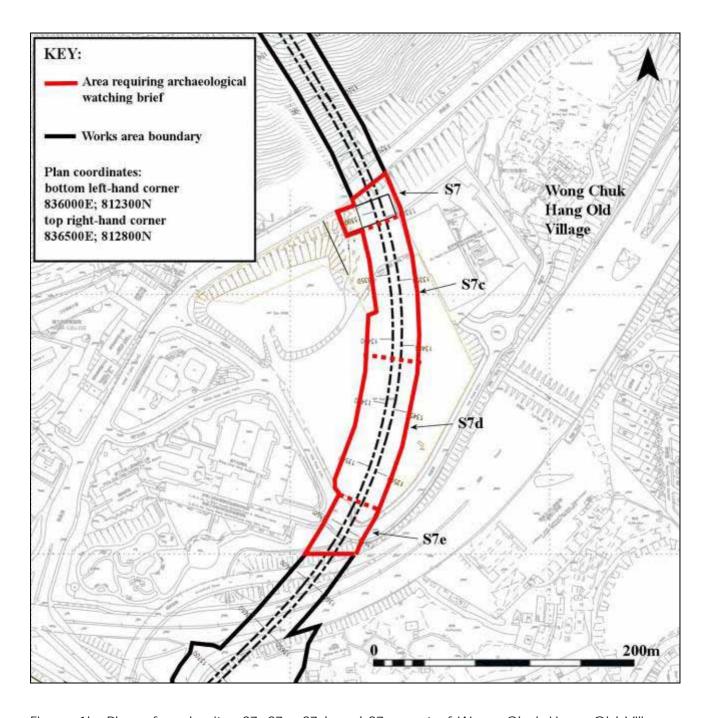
Plan of works sites S7, S7c, S7d and S7e west of Wong Chuk Hang Old Village with area requiring archaeological watching brief outlined in red.
